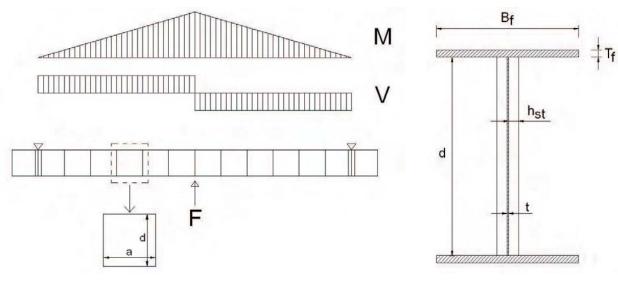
SYMMETRICAL STEEL BEAM SECTION AND LOADING
